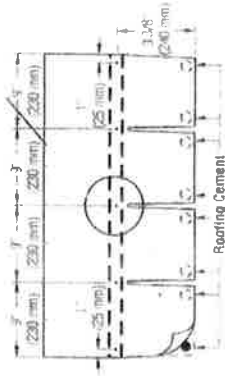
Fastening Hatteras Shingles on Steep Slopes
